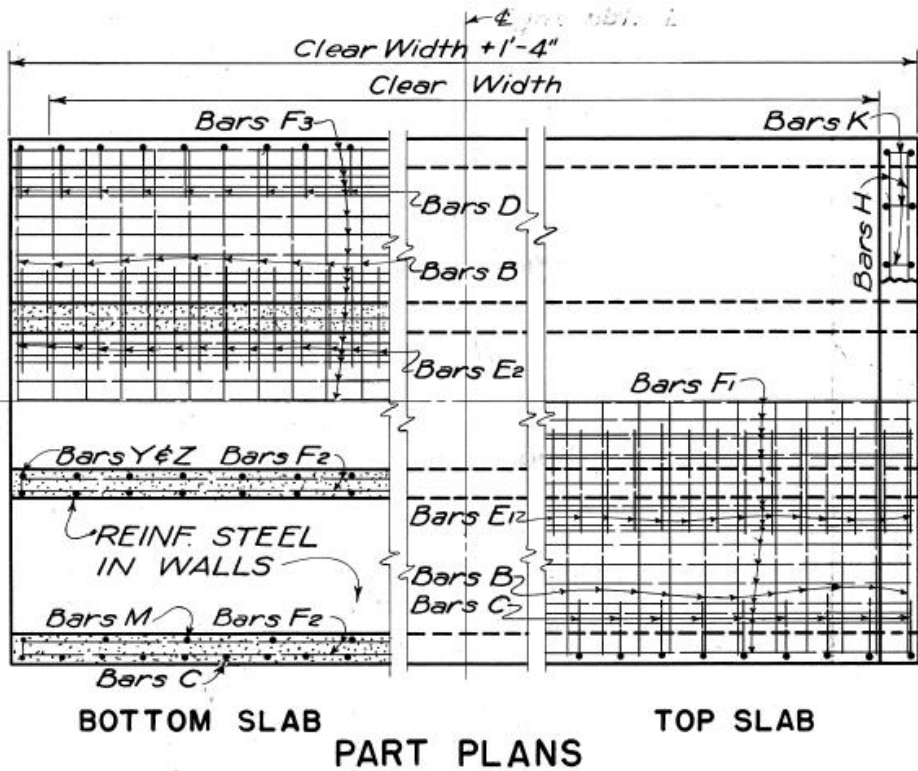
EXAMPLE CULVERT, DESIGNATION OF REINFORCING STEEL AS PER PLAN SHEET.
